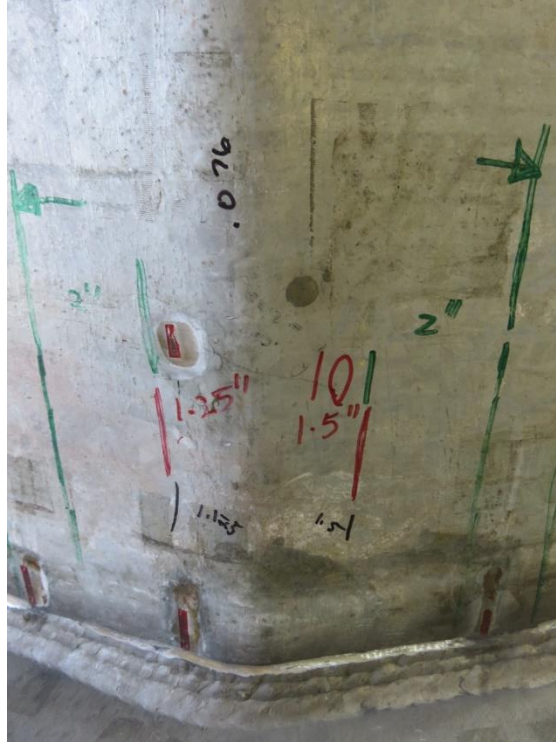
Slight Grinding of the Cross-Section to Expose the Cracks: Specimen 33-3-12-TX-A3 – Bend 10
